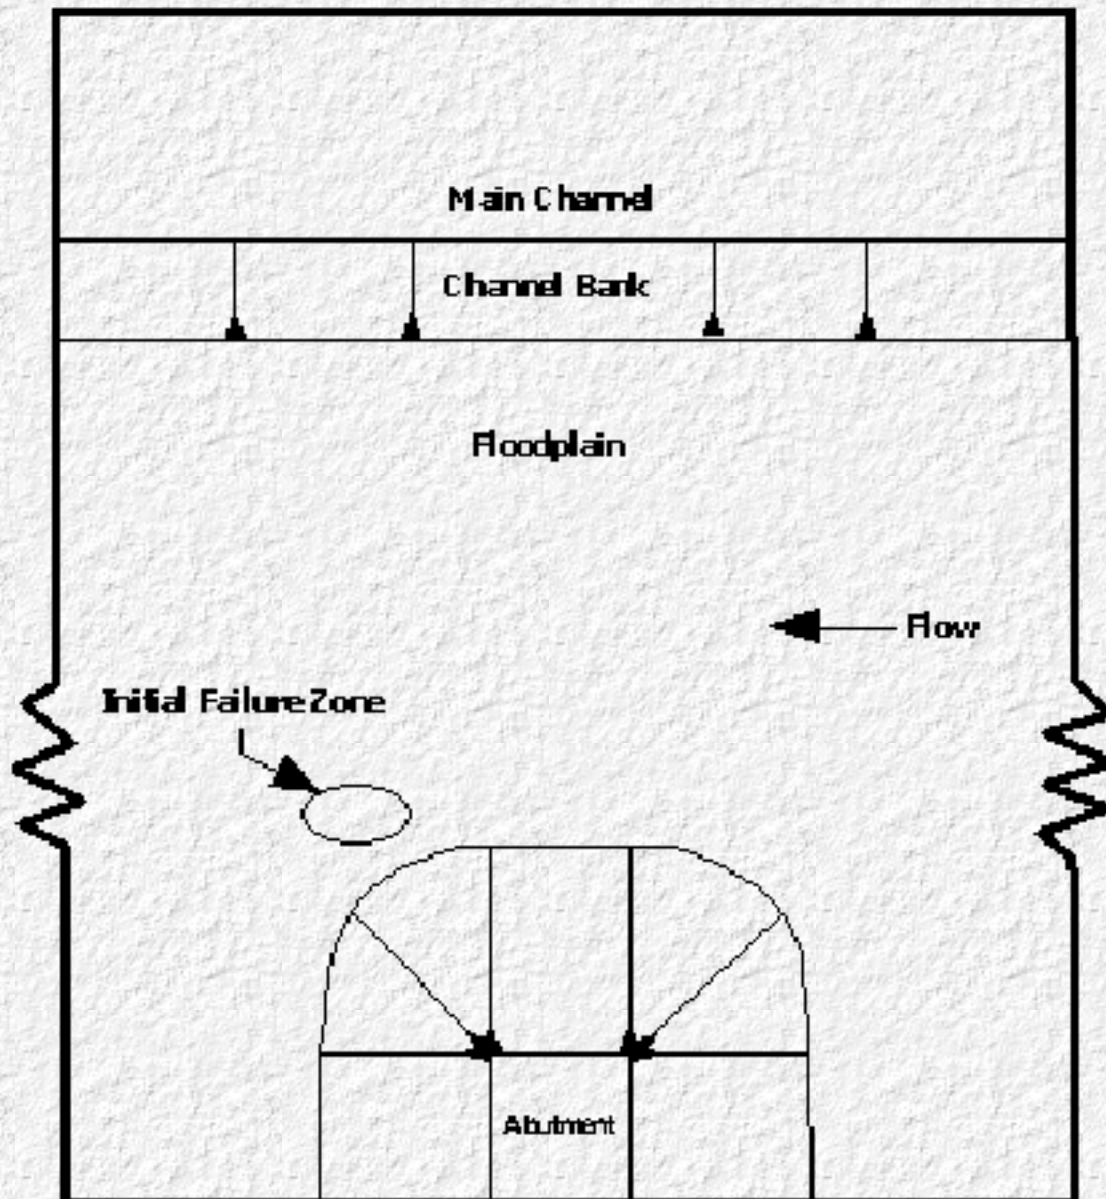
Plan View of the Location of Initial Failure Zone of Rock Riprap for Spill-Through Abutment
